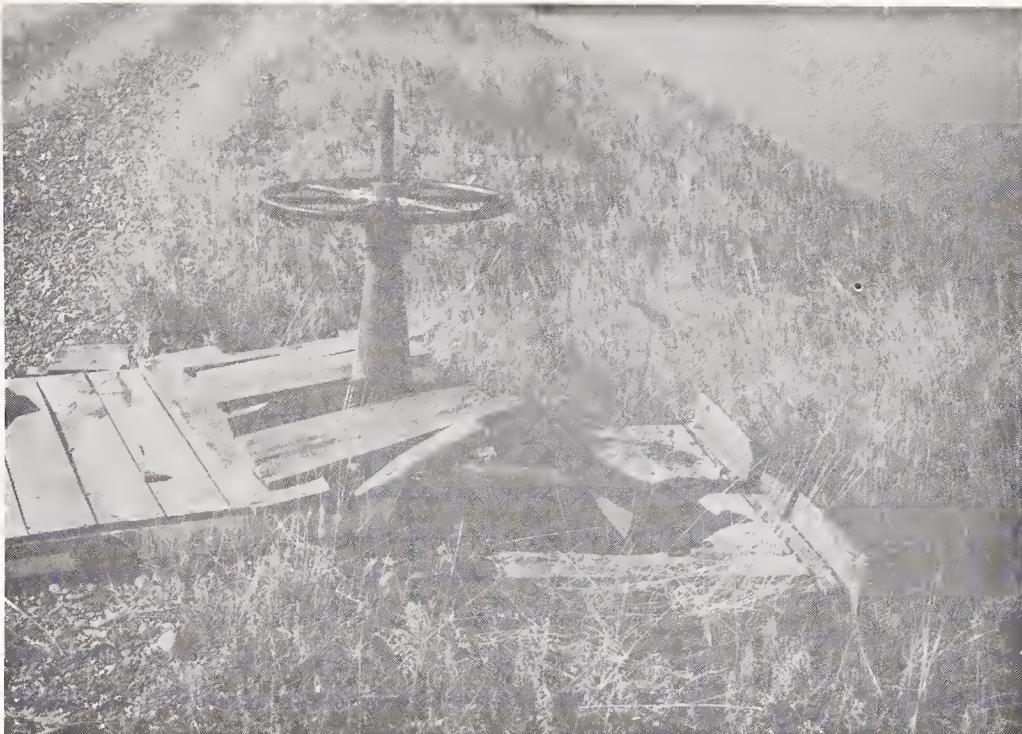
VAUX #2 SOUTH ABUTMENT DOWNSTREAM FACE
